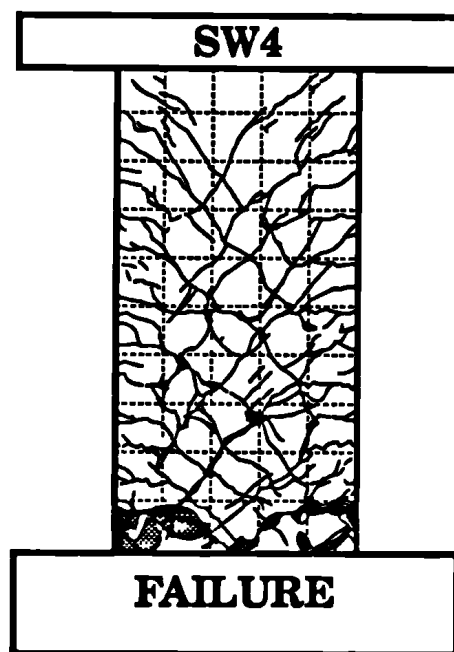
PilaSW4: DS4d - cracks at MDL-22 (core crushing)
